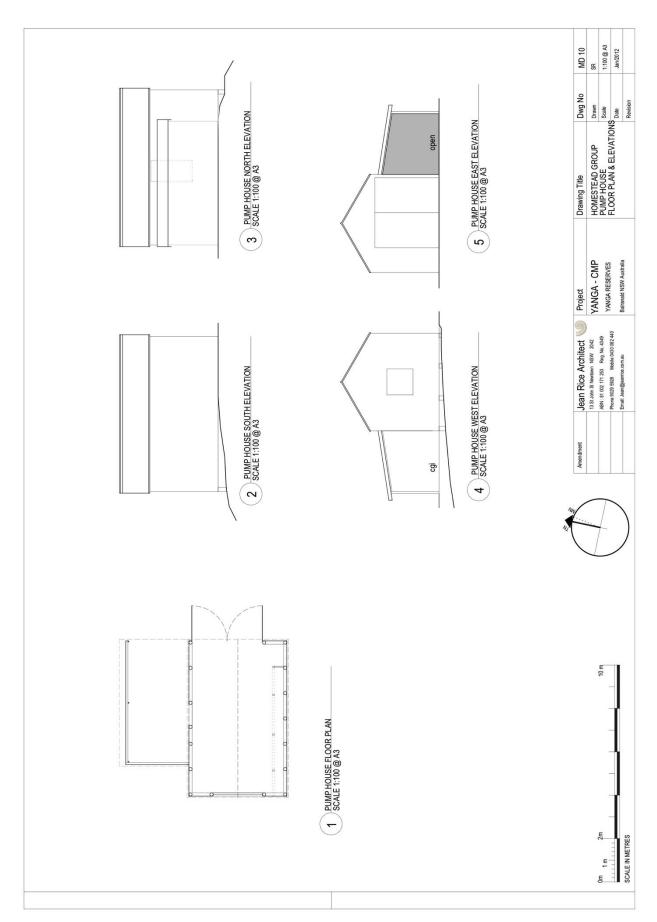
Homestead Group Pump House floor plans and elevations. Jean Rice Architect, site assessment 2009.
